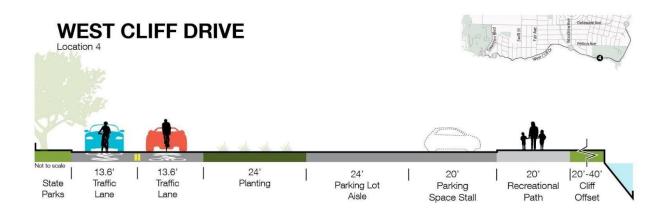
West Cliff Drive Alternative 1 Enhancements at Cross Section of State Parks Parking Lot A
